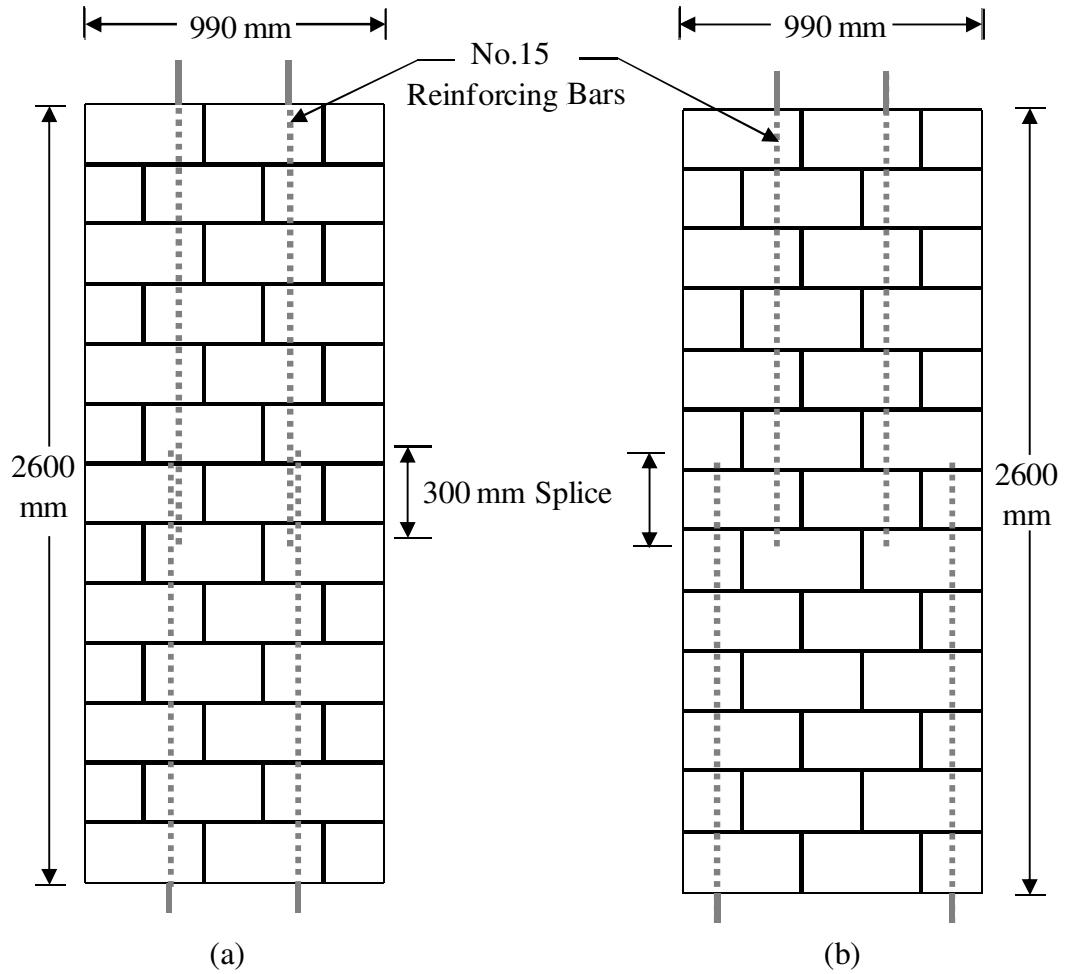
Elevation of wall splice specimens with: (a) contact lap splices, and (b) non-contact lap splices.
